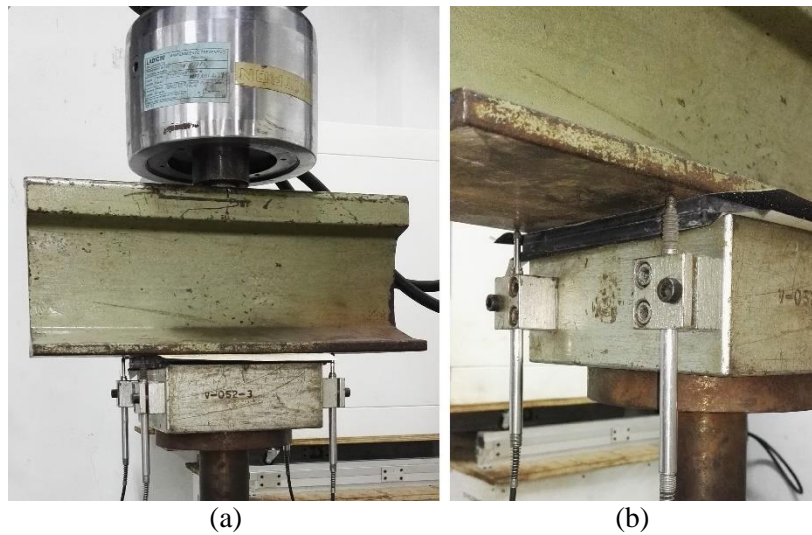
Fastening system tests: (a) General view; (b) LVDTs located in each side of the rail foot
